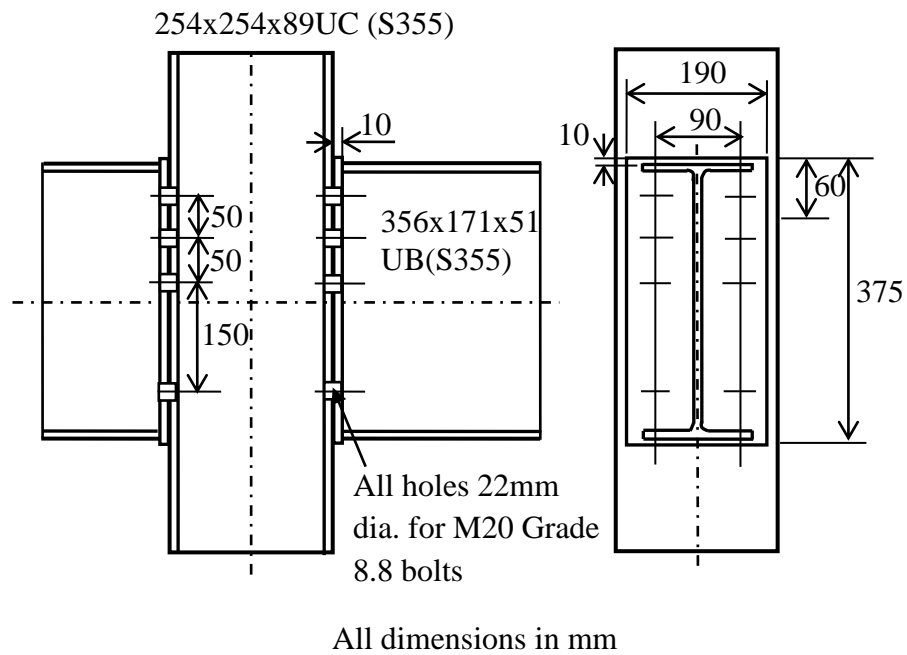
Details of test specimens used by Al-Jabri (1999)
